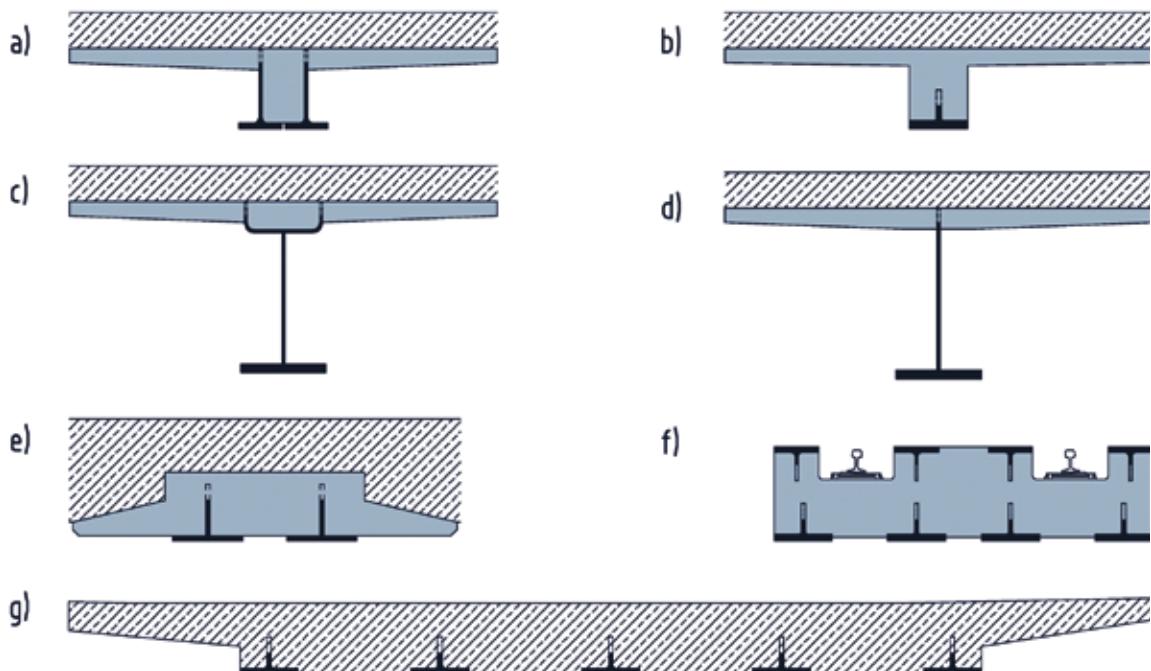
, Typified cross section: VFT-WIB method as 'Duo-WIB' (a+e) and 'Mono-WIB' (b) and with welded profiles (c+d); special form as VFT-Rail (f) and external reinforcement in a cast in situ slab (g)
